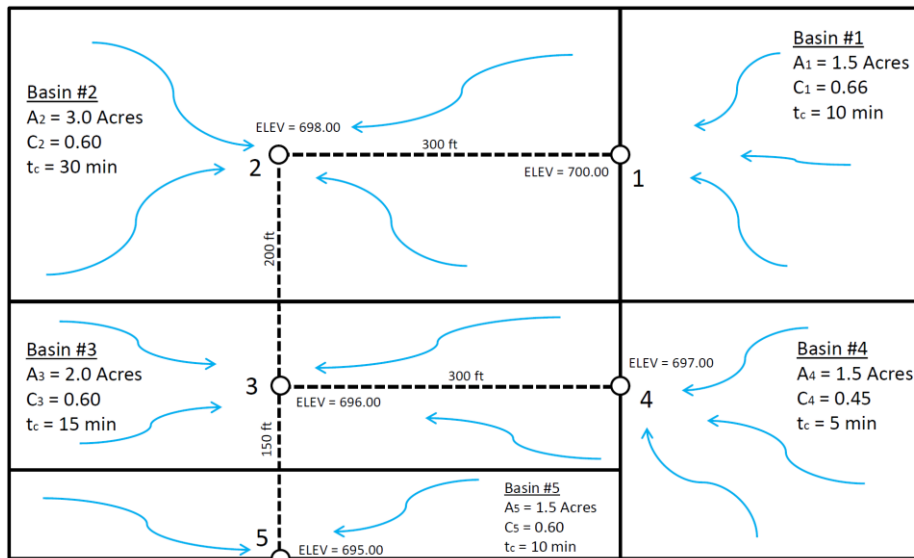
Proposed Drainage Schematic for Storm Sewer Sizing
